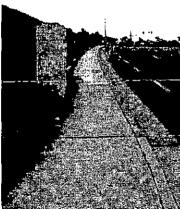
Sidewalk along northern boundary of the site, looking west along La Jolla Village Drive
